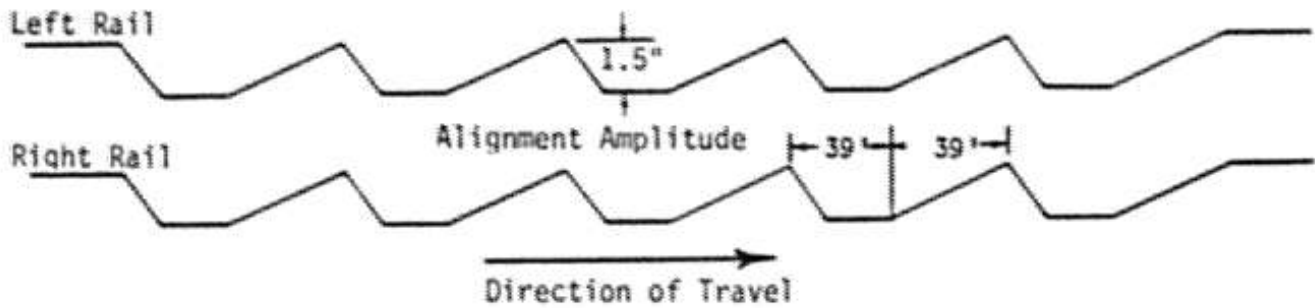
PLAN VIEW OF PTT TEST SECTION 8
